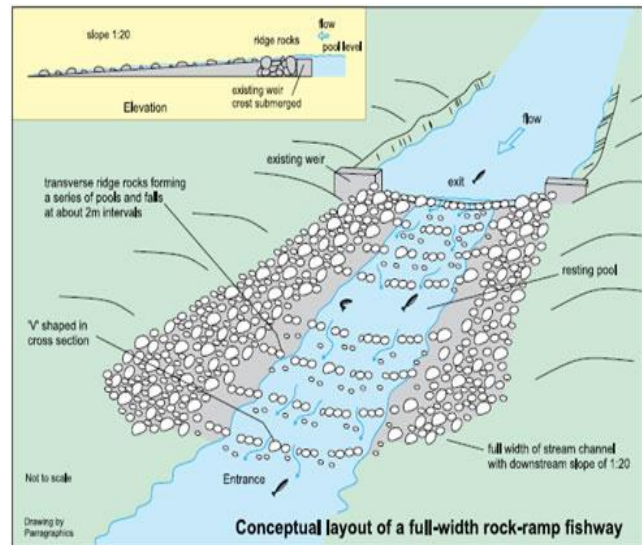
Rock Ramp Schematic (Corps of Engineers)
